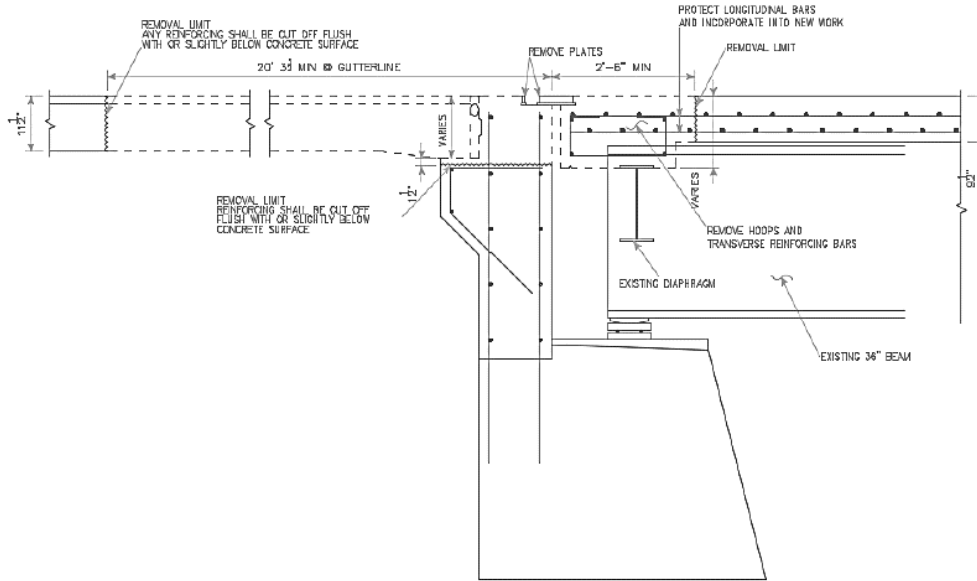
Concrete removal process for Iowa DOT joint. Source: Iowa DOT.
